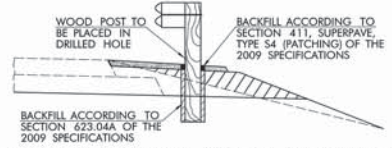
DETAIL OF SHOULDER WIDENING FOR STANDARD GUARDRAIL
